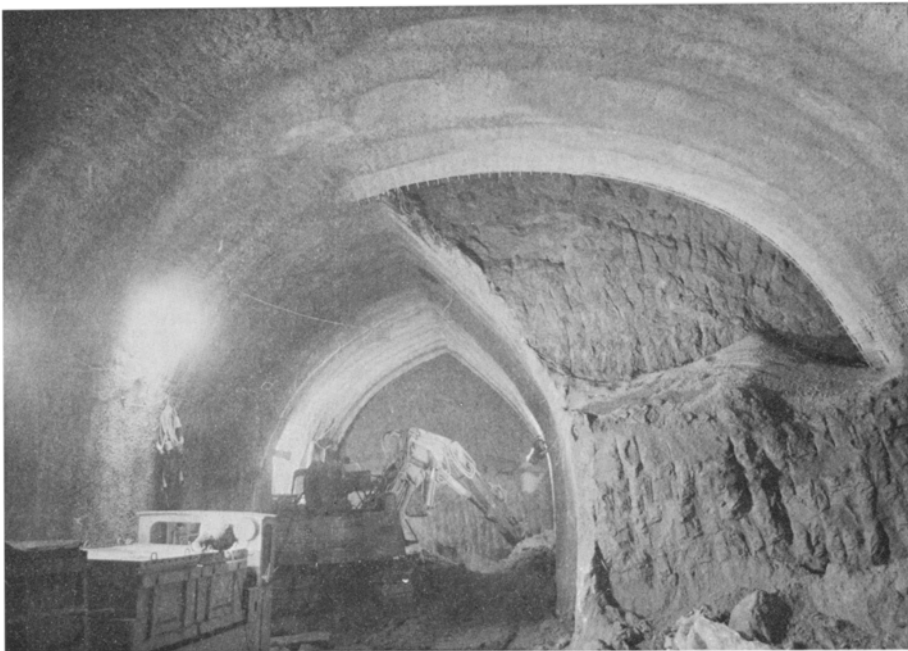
Construction of a station of the line U 5/9 of the Munich Underground
